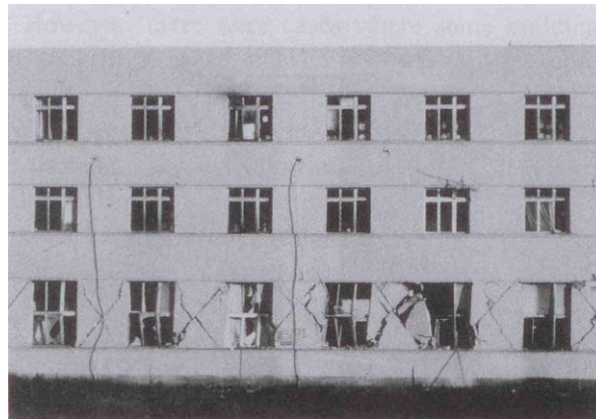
Typical shear cracks in window piers of a brick-masonry building, Budva, Montenegro, 1979 (from Tomažević, 1999).
